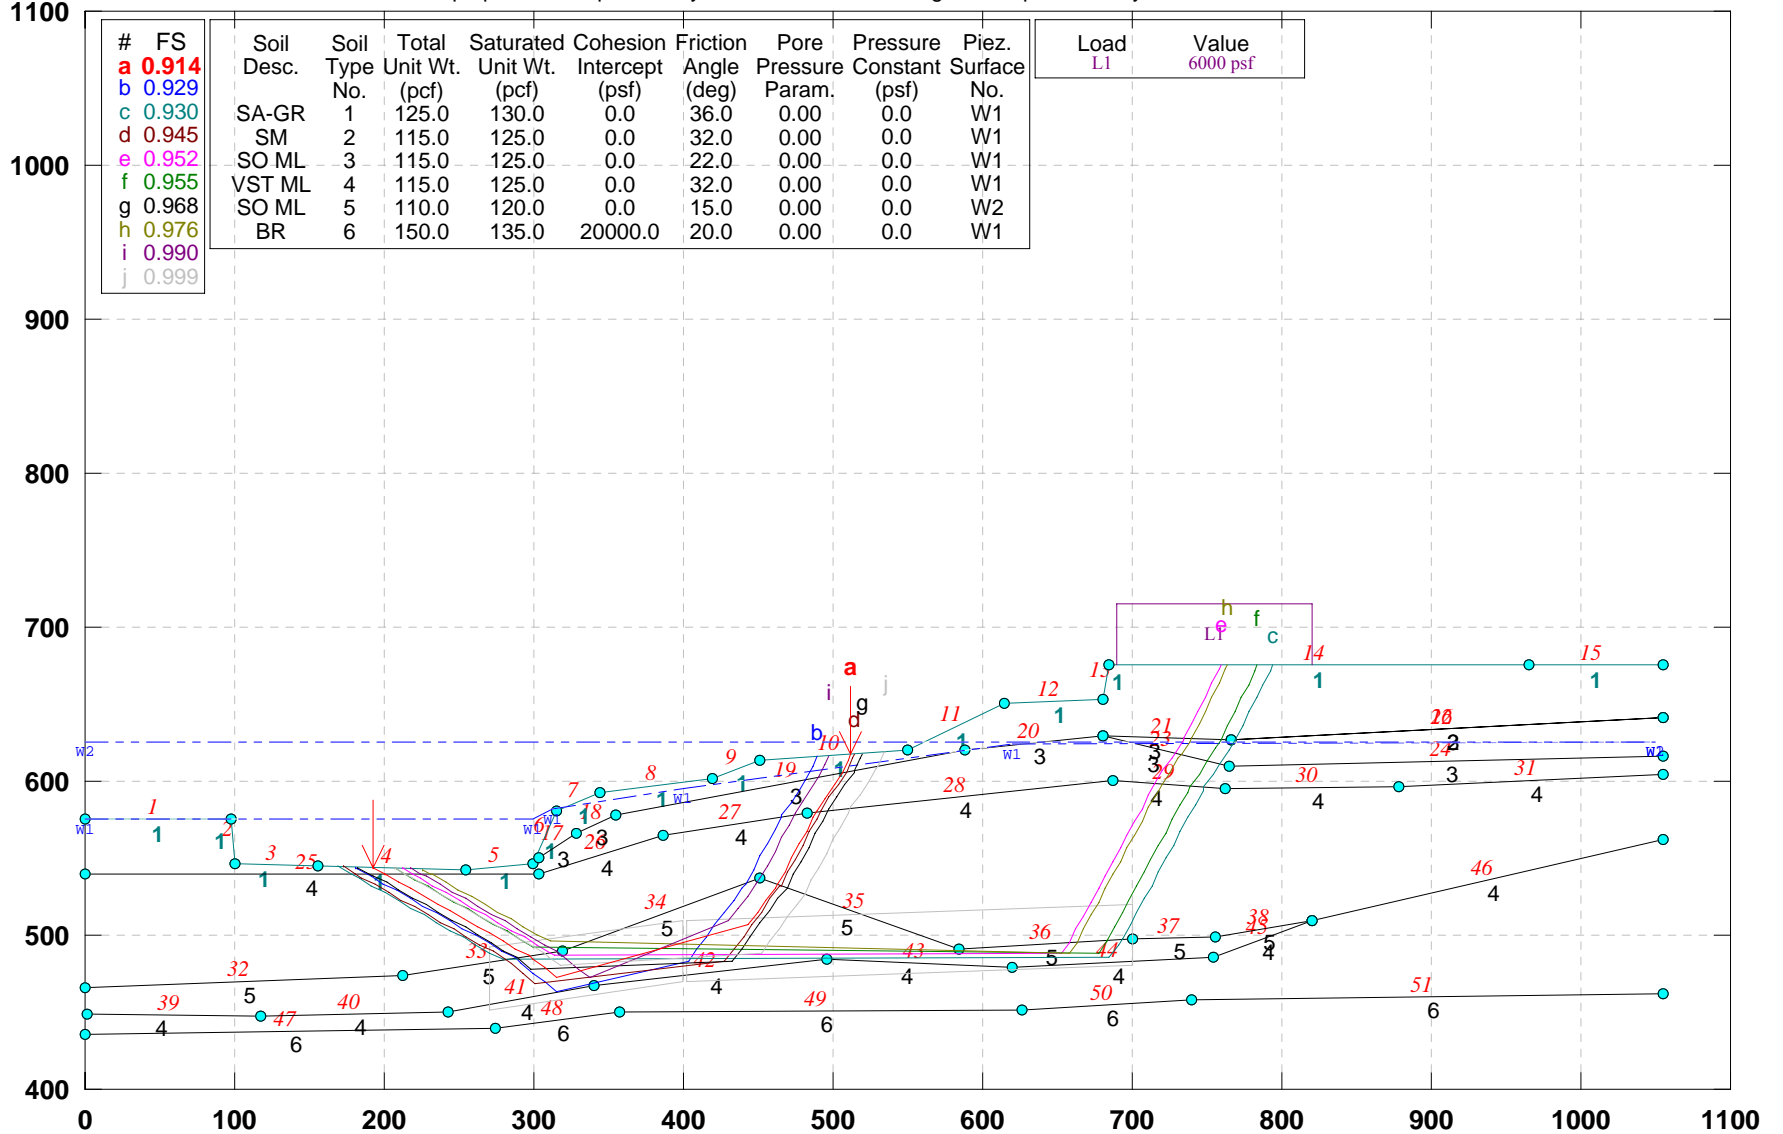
B.29: Slope Excavation (5:1 and 9:1 slopes) and vertical and horizontal drains.
